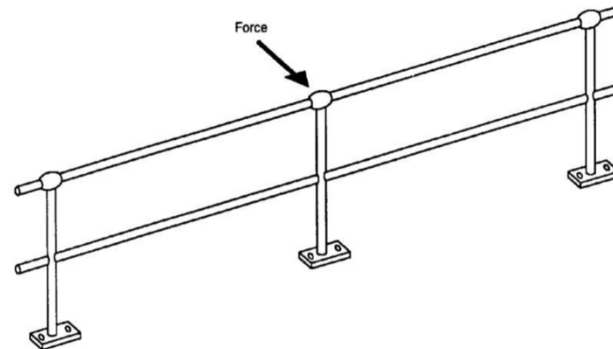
TYPICAL GUARDRAIL POST TEST
